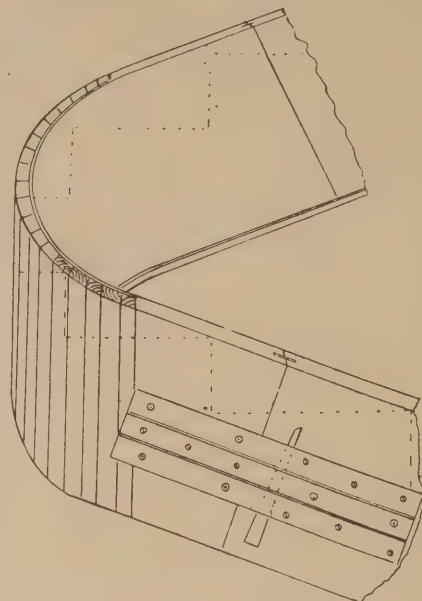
METHOD OF FORMING AND FIXING A WREATHED STRING.
